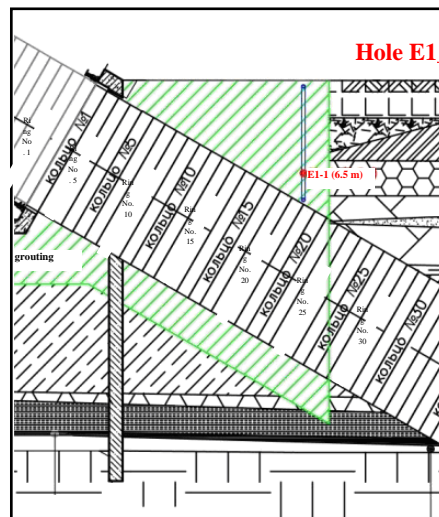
Hole E1 with subsurface check mark (extensometer) at jet grouting section
